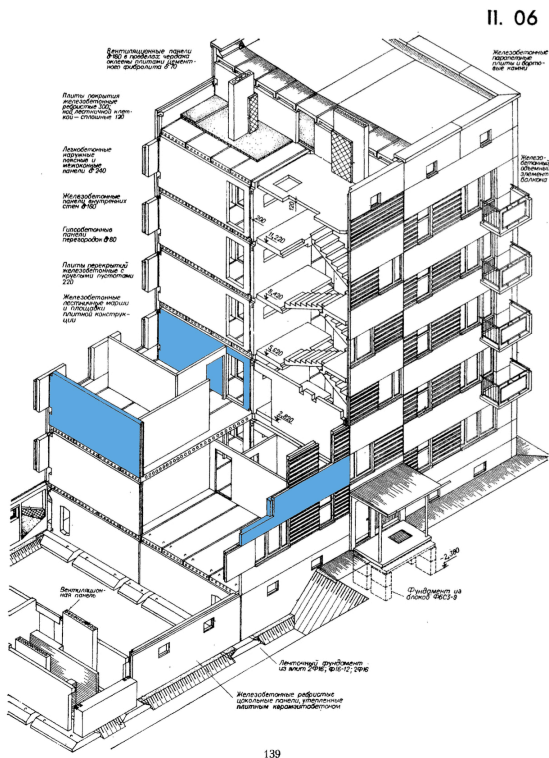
Axonometric Structural scheme. Transverse inter-apartment and facade walls [31]
